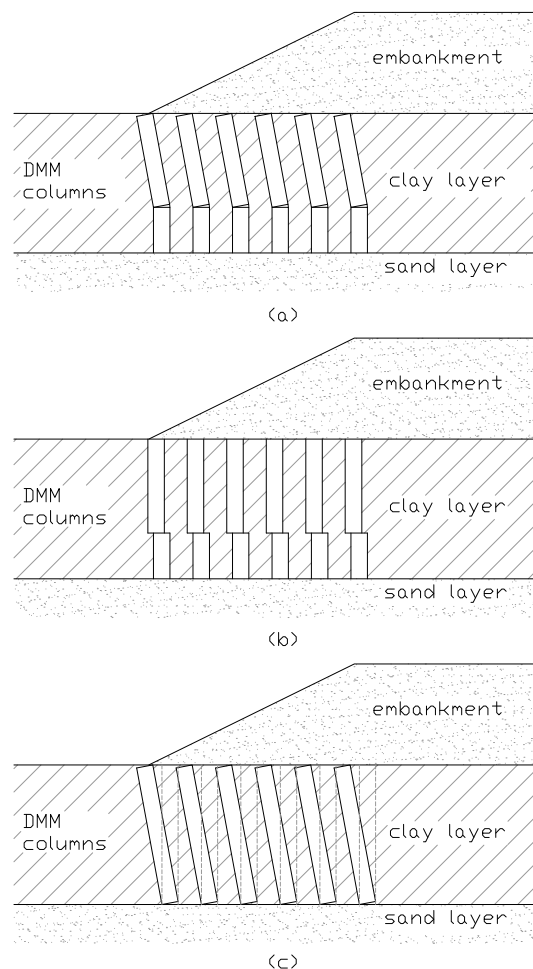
Failure modes of a group of individual columns under embankment loading (Kitazume, 2008)
